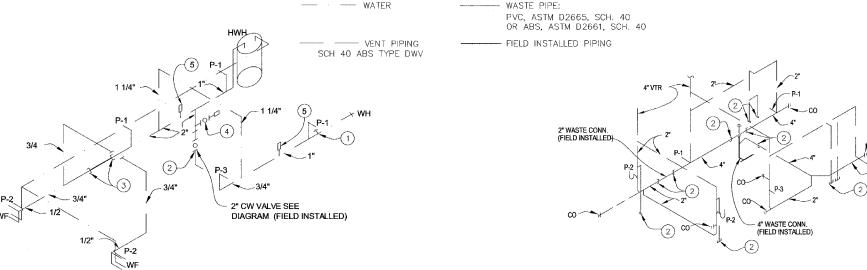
DETAIL OF FIELD INSTALLED WASTE CONNECTION
